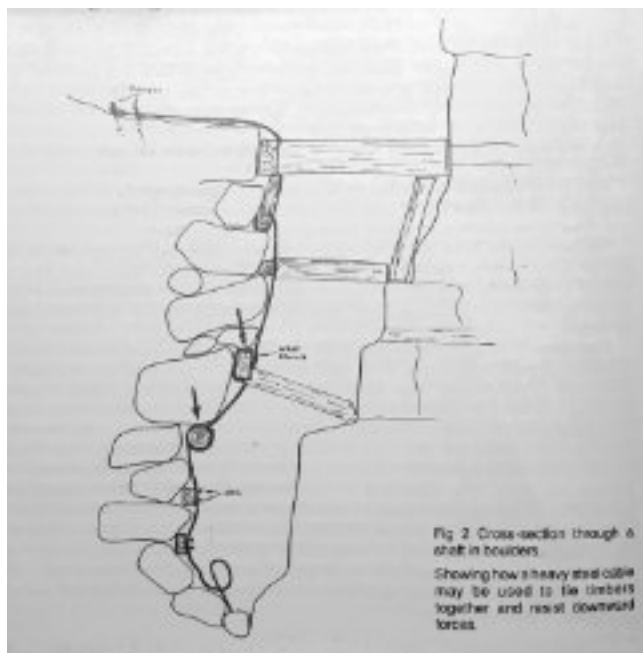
Cross-section through a shaft in boulders. Showing how a heavy steel cable may be used to tie timbers together and resist downward forces.
